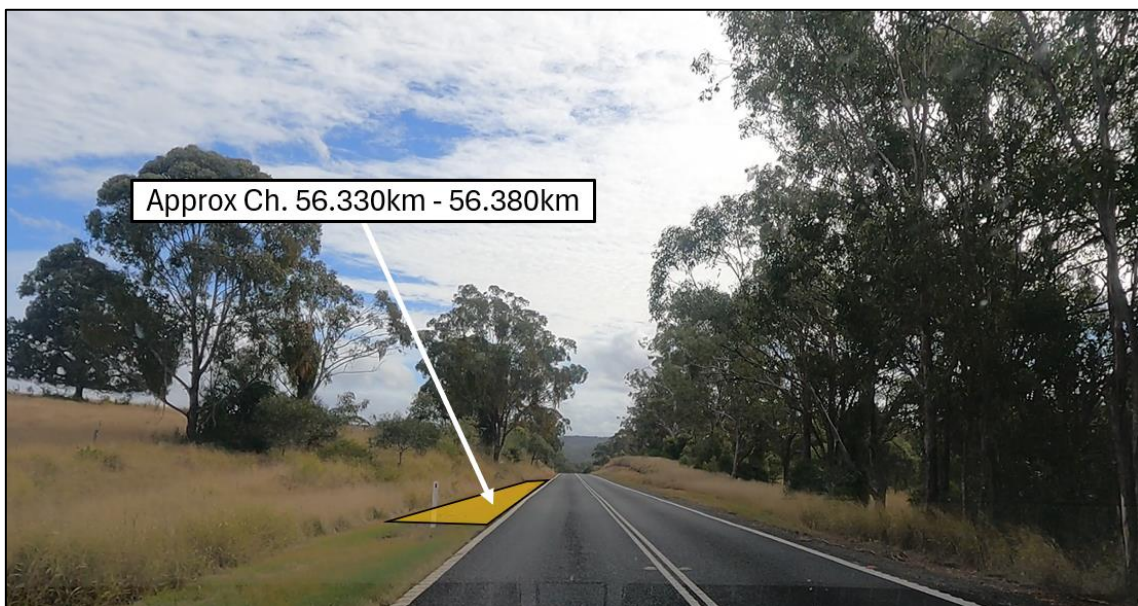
Proposed access location 2 (Ch. 56.330km – 56.380km) (facing north-east)
